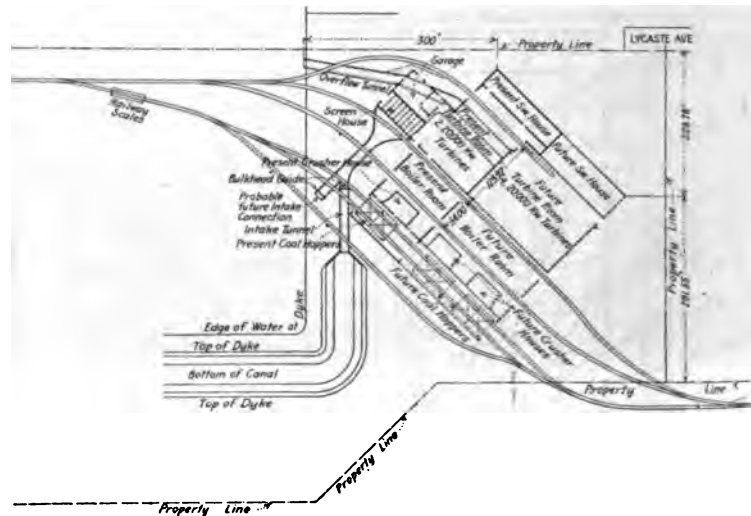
PLAN OF SITE OF THE NEW CONNORS CREEK POWER HOUSE
